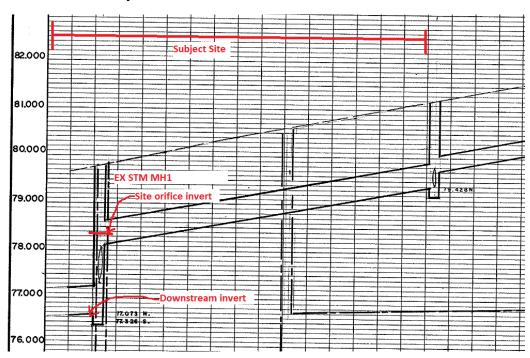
Excerpt from plan-profile MN-5\_21 of North Shore Boulevard marked-up showing outlet condition at subject site storm sewer connection
